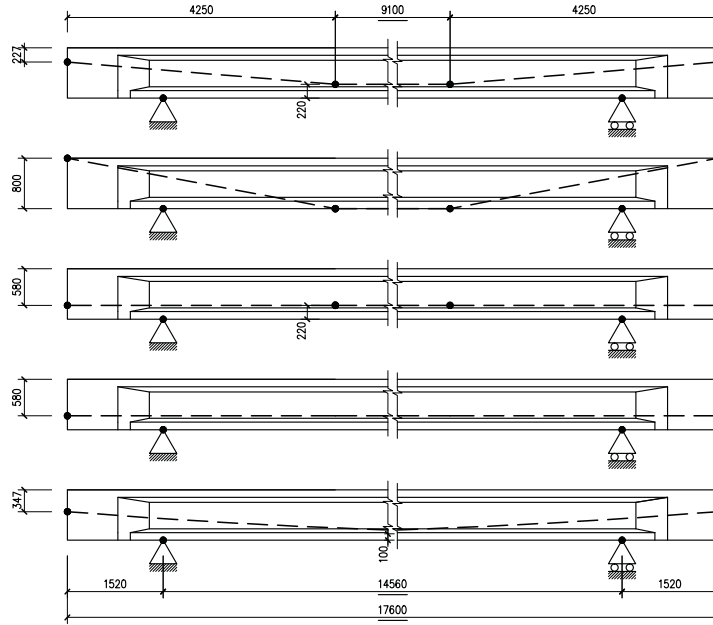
Longitudinal layout of the prestressing steel. From the top: a) draped D1, b) draped D2, c) draped D3, d) straight bonded and unbonded, e) parabolic bonded.
